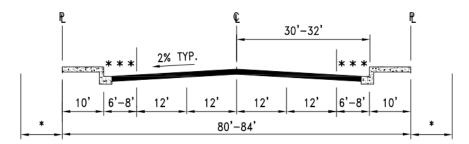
Proposed Typical Section for Secondary Arterial (Parking-Protected Bike Lanes)
